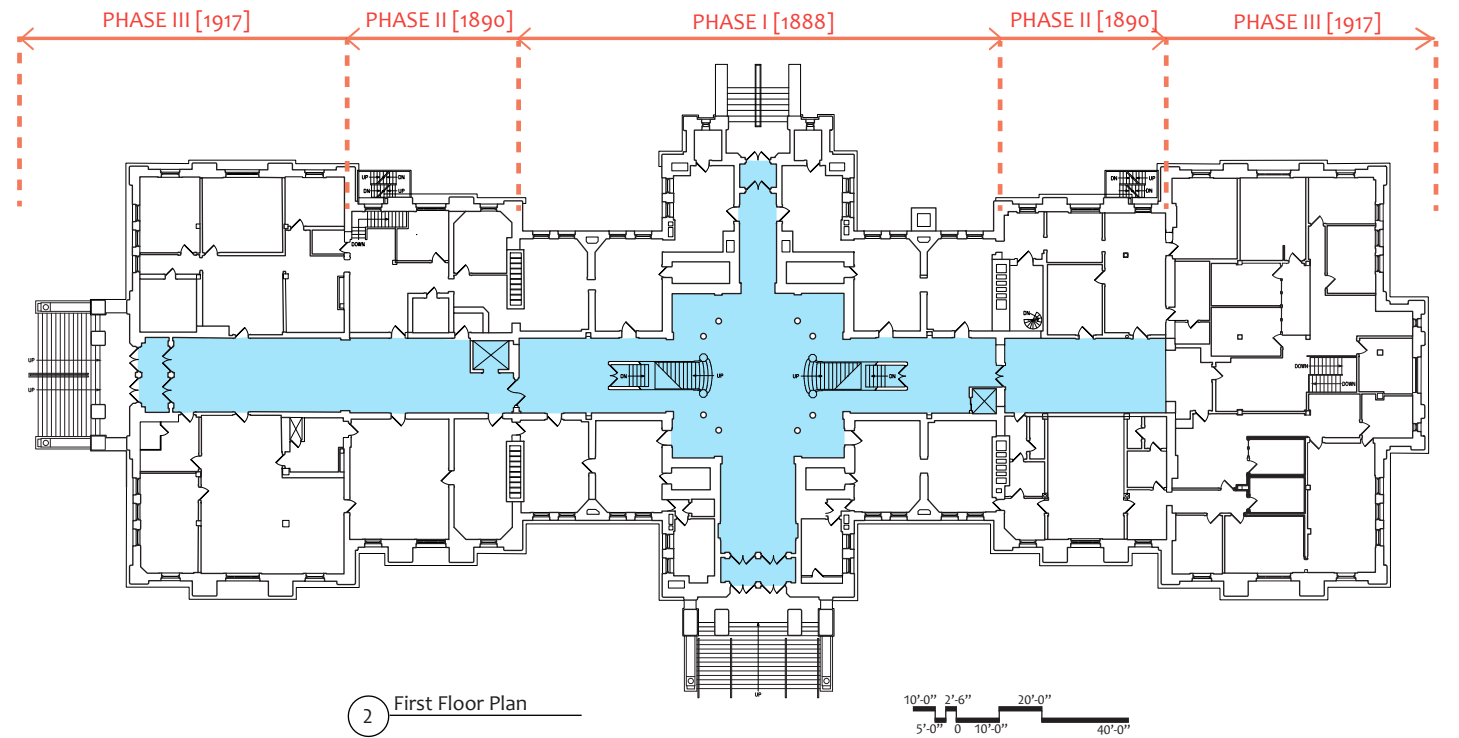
First Floor Plan of Rotunda and Monumental Corridors [highlighted in light blue]
